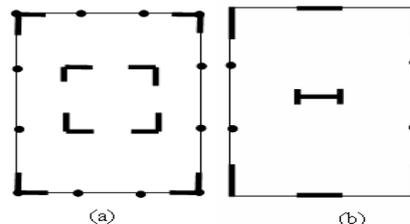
Recommended arrangement of shear walls and braced frames. Heavy lines indicate Shear walls and/or braced frames.
